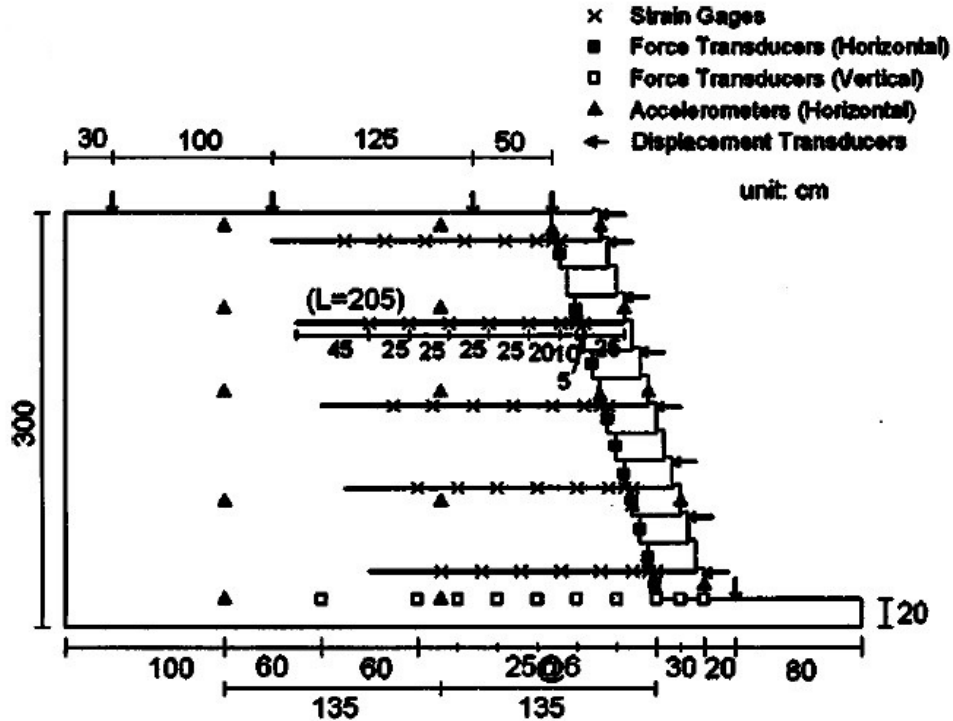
Cross-section view and instrumentation layout for Wall 1 in full-scale shaking table tests (from Ling et al. 2005a).
